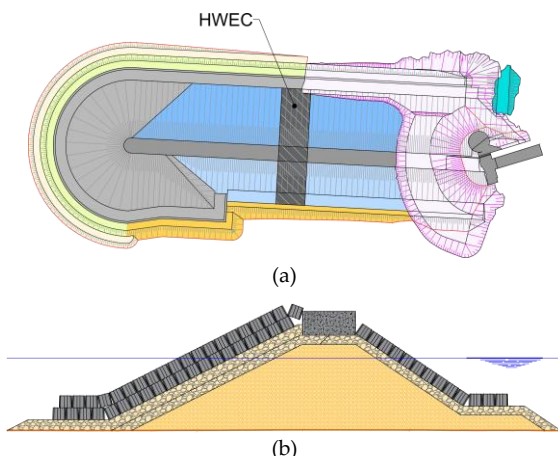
Planned extension of the North breakwater of the Port of Leixões: (a) plan view and (b) cross section.
